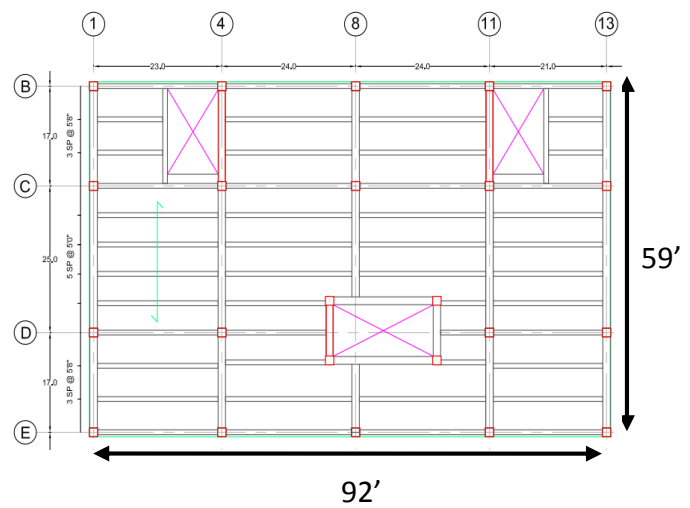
Typ. Floor plan of the proposed one way slab with beams. Multiple grid lines were altered/removed as necessary to create a systematic grid.
